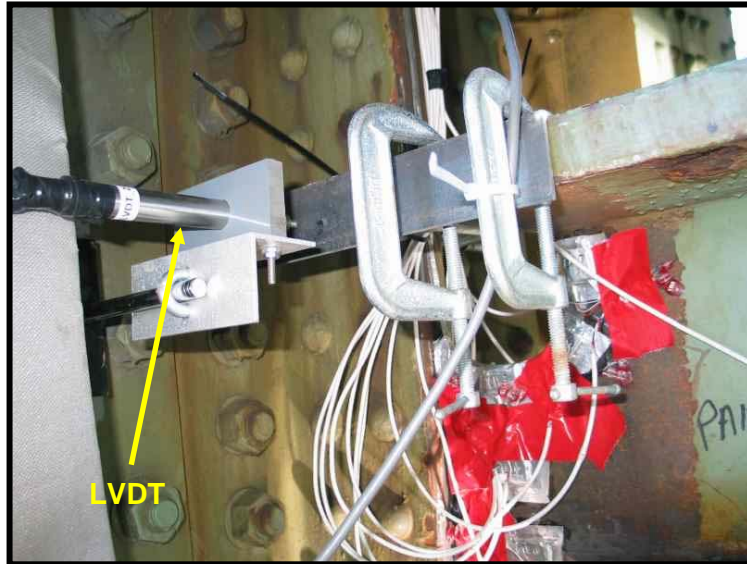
Horizontal LVDT installed at floorbeam FB77
